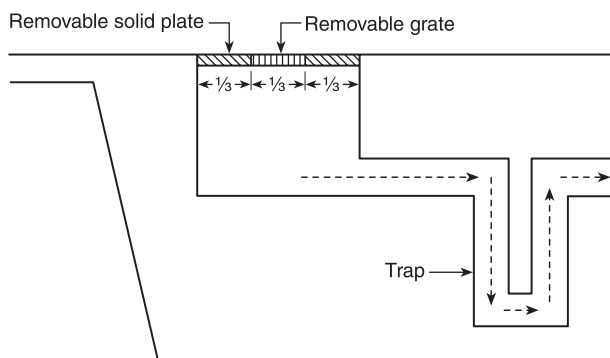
(c) Details of Drainage Trench Design.
